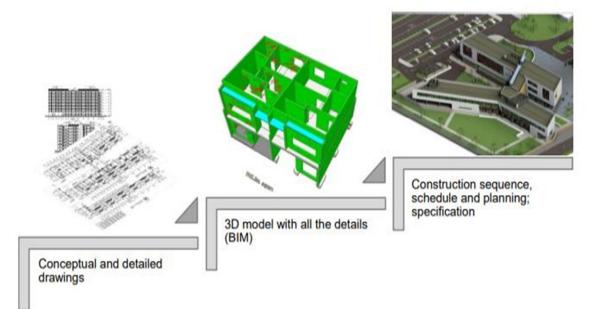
The key steps in traditional approach towards construction monitoring and planning
